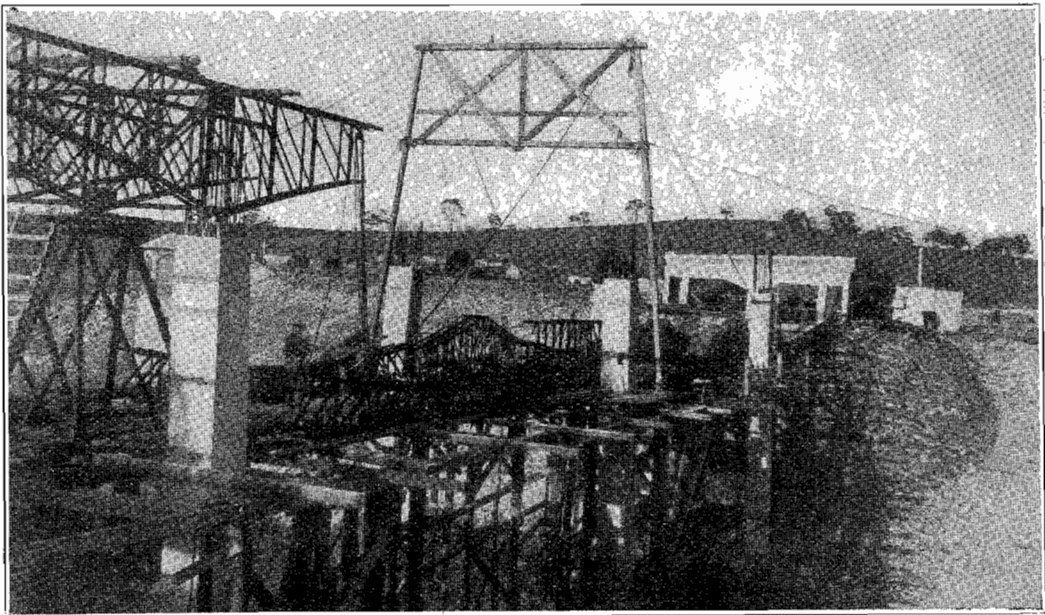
Pyke's Creek bridge, near Ballan, Western Highway, Section 1. Showing welded steel trusses partly erected.
